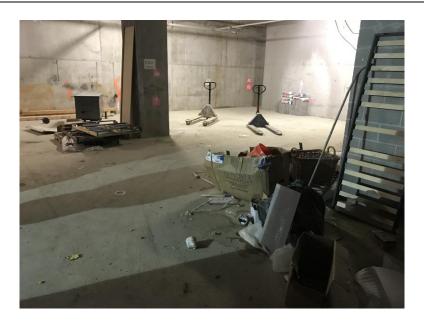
View of the partially disturbed concrete floor in the south central portion of the cellar of the East Tower; facing north. Dated 12/19/2017.
